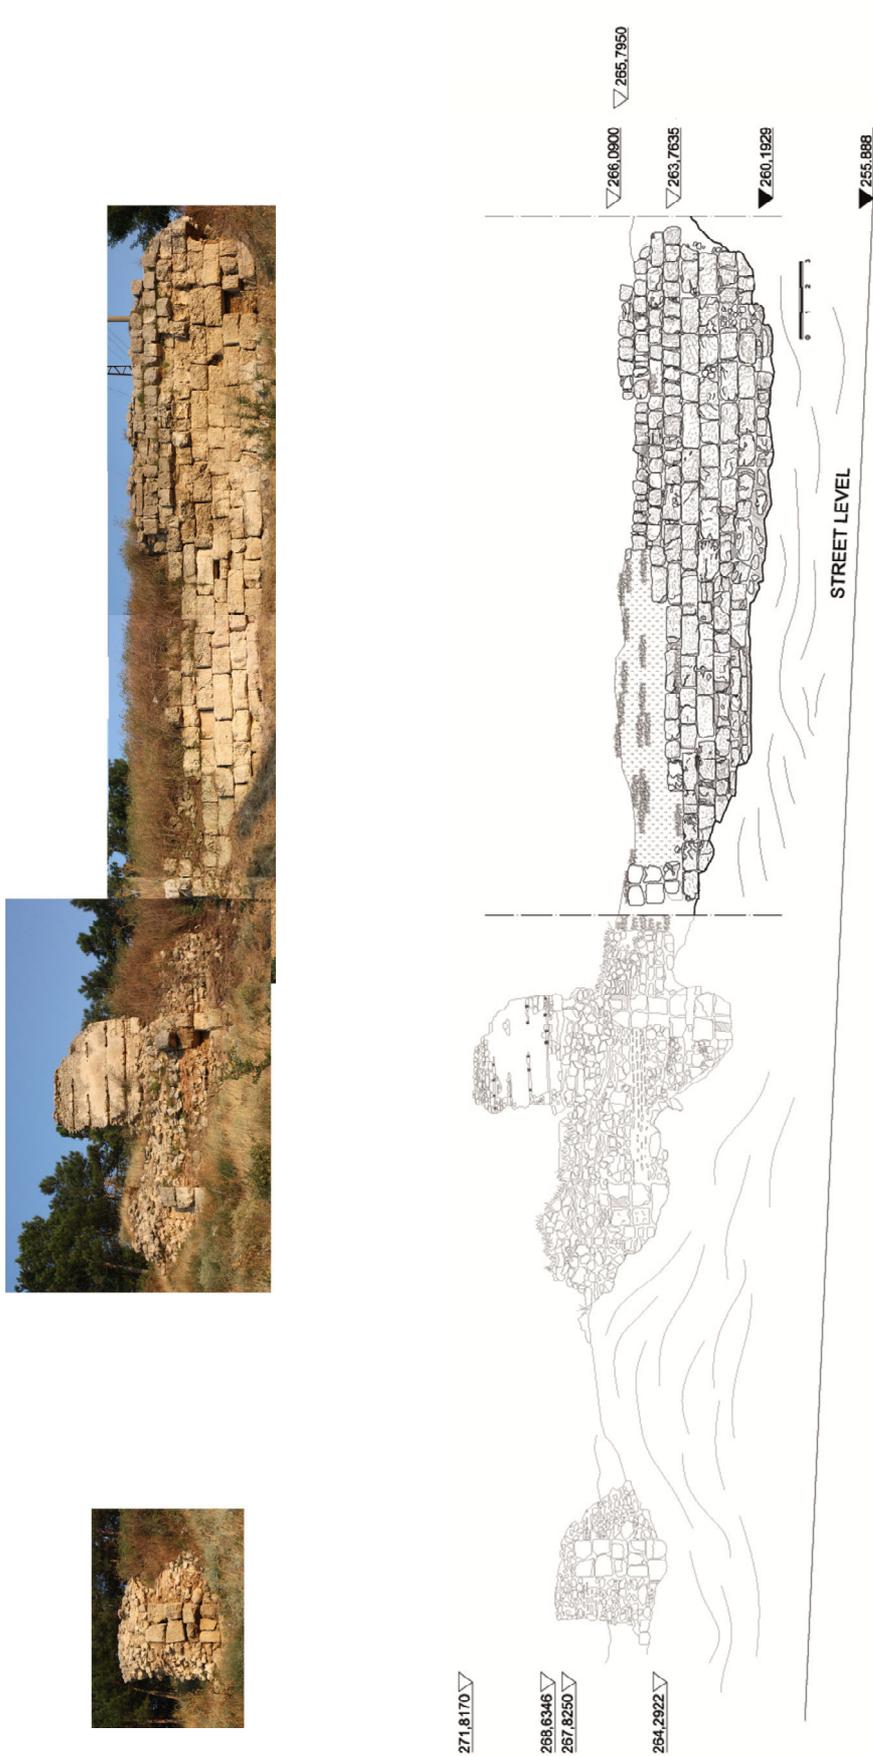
Terrace walls, W1.1, W1.2, WP1, WP2, photo by author (2013).
